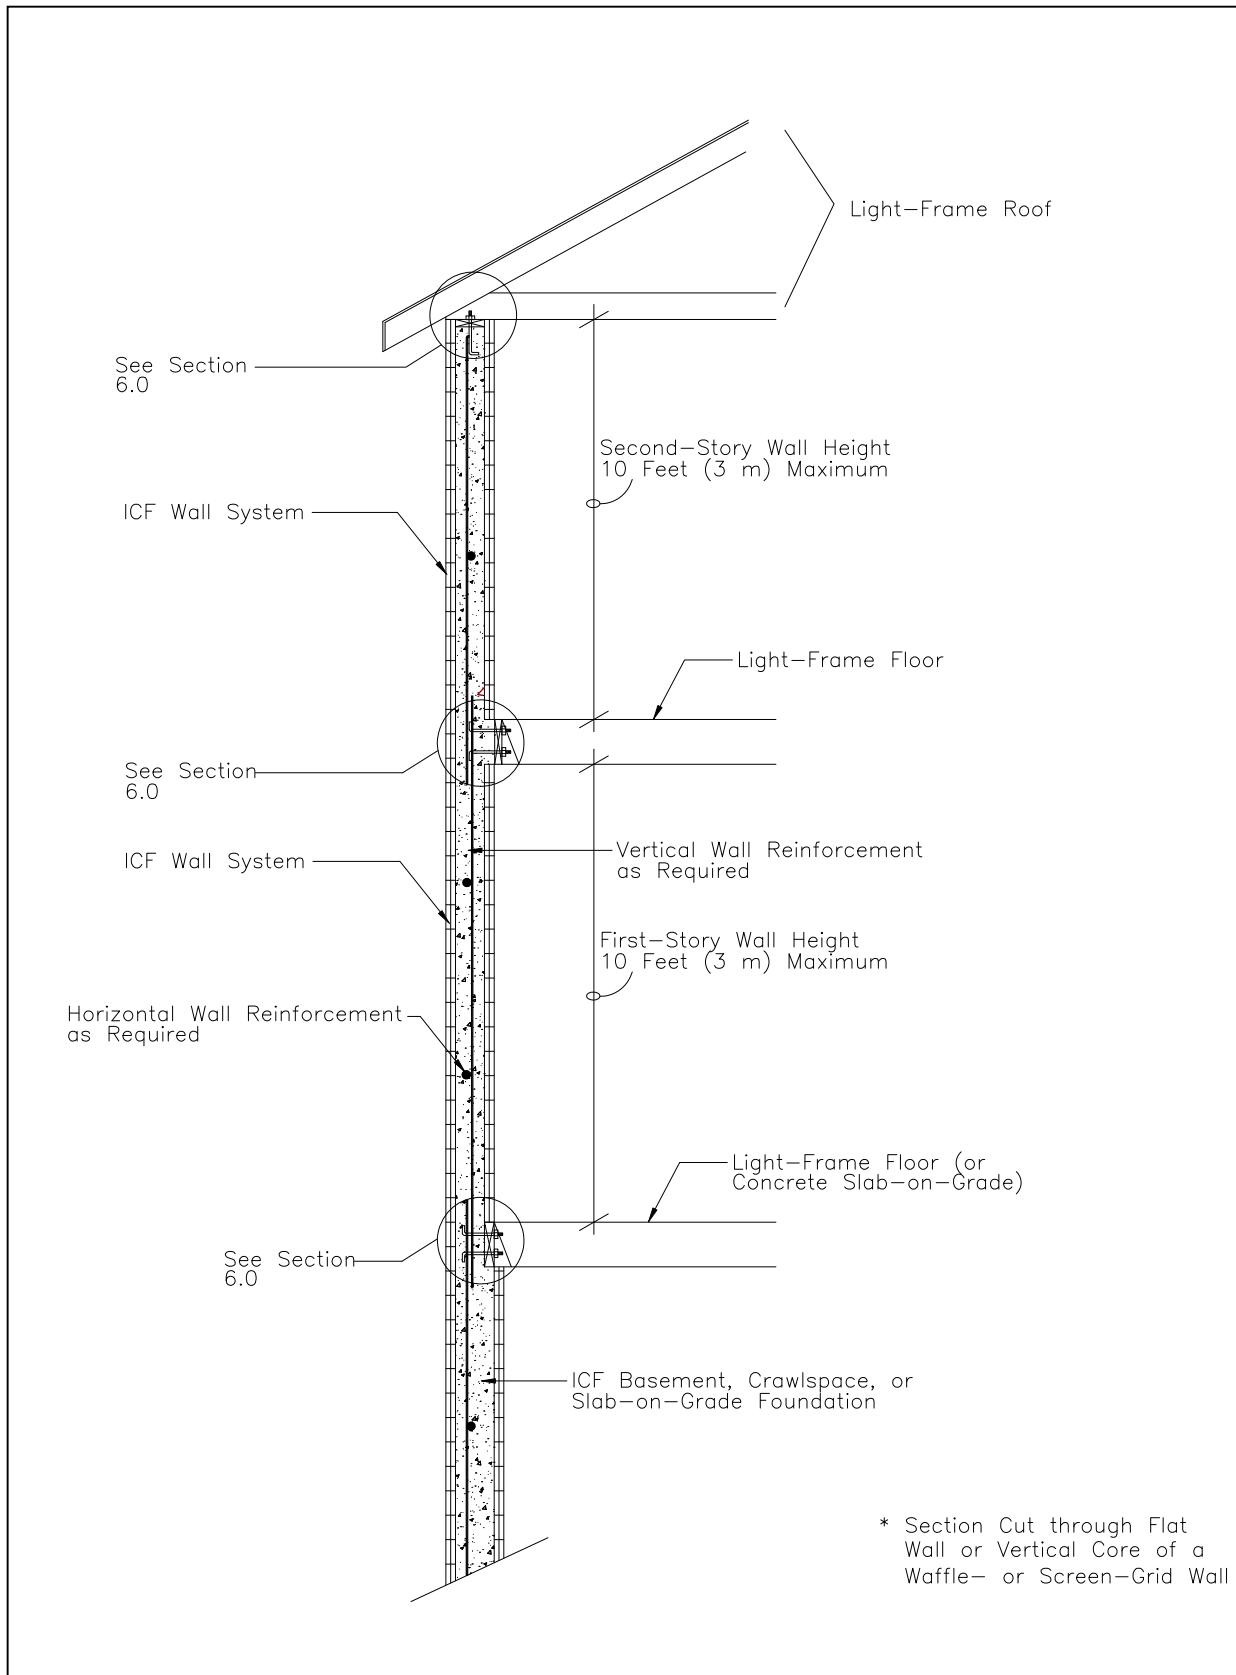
ICF Wall Supporting ICF Second Story and Light-Frame Roof
